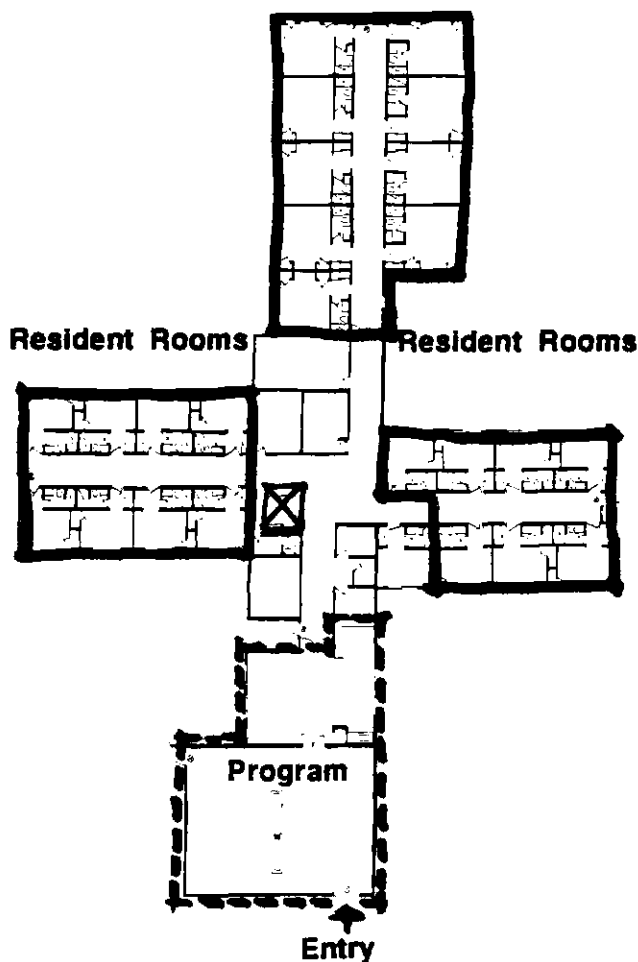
The DAY Alzheimer's Unit - Floor Plan Showing the Pinwheel Design With Nurses Station in the Center
